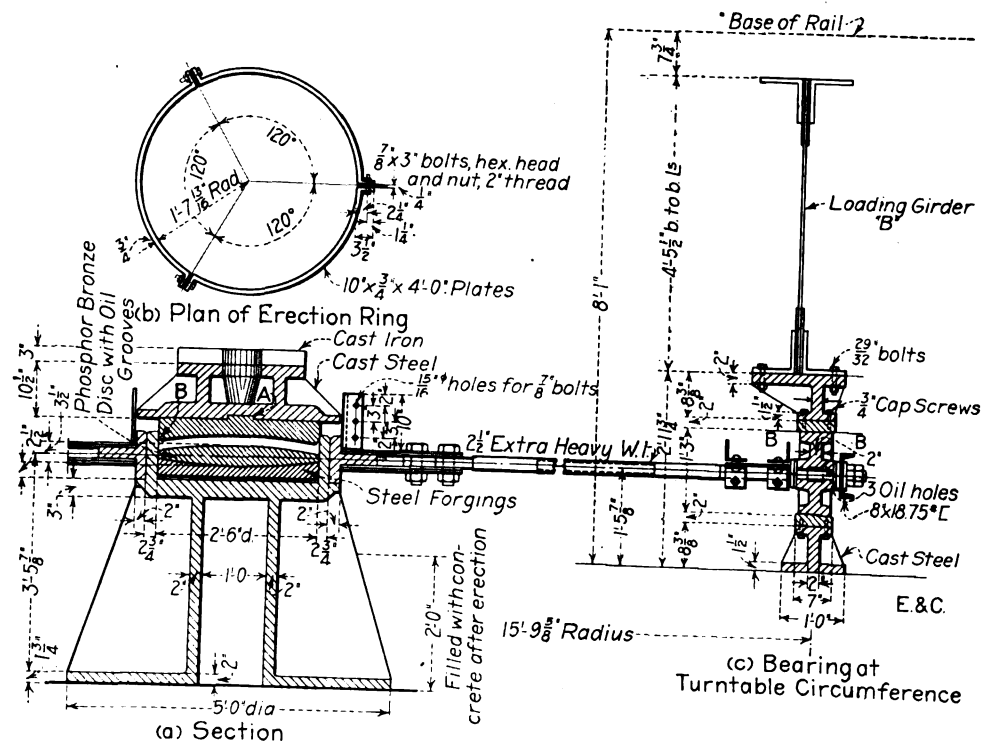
Cross Sections of Center Bearing and Turntable Circle and Bearing of C. & N. W. Ry. Bridge—Note Erection Ring Used in Setting Span on Center Bearing.
